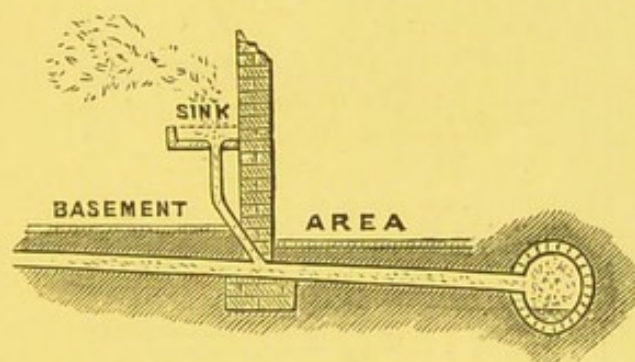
House-drain directly connected with main sewer; sink-waste untrapped, and directly connected with house-drain; air from sewer escaping into the house.
